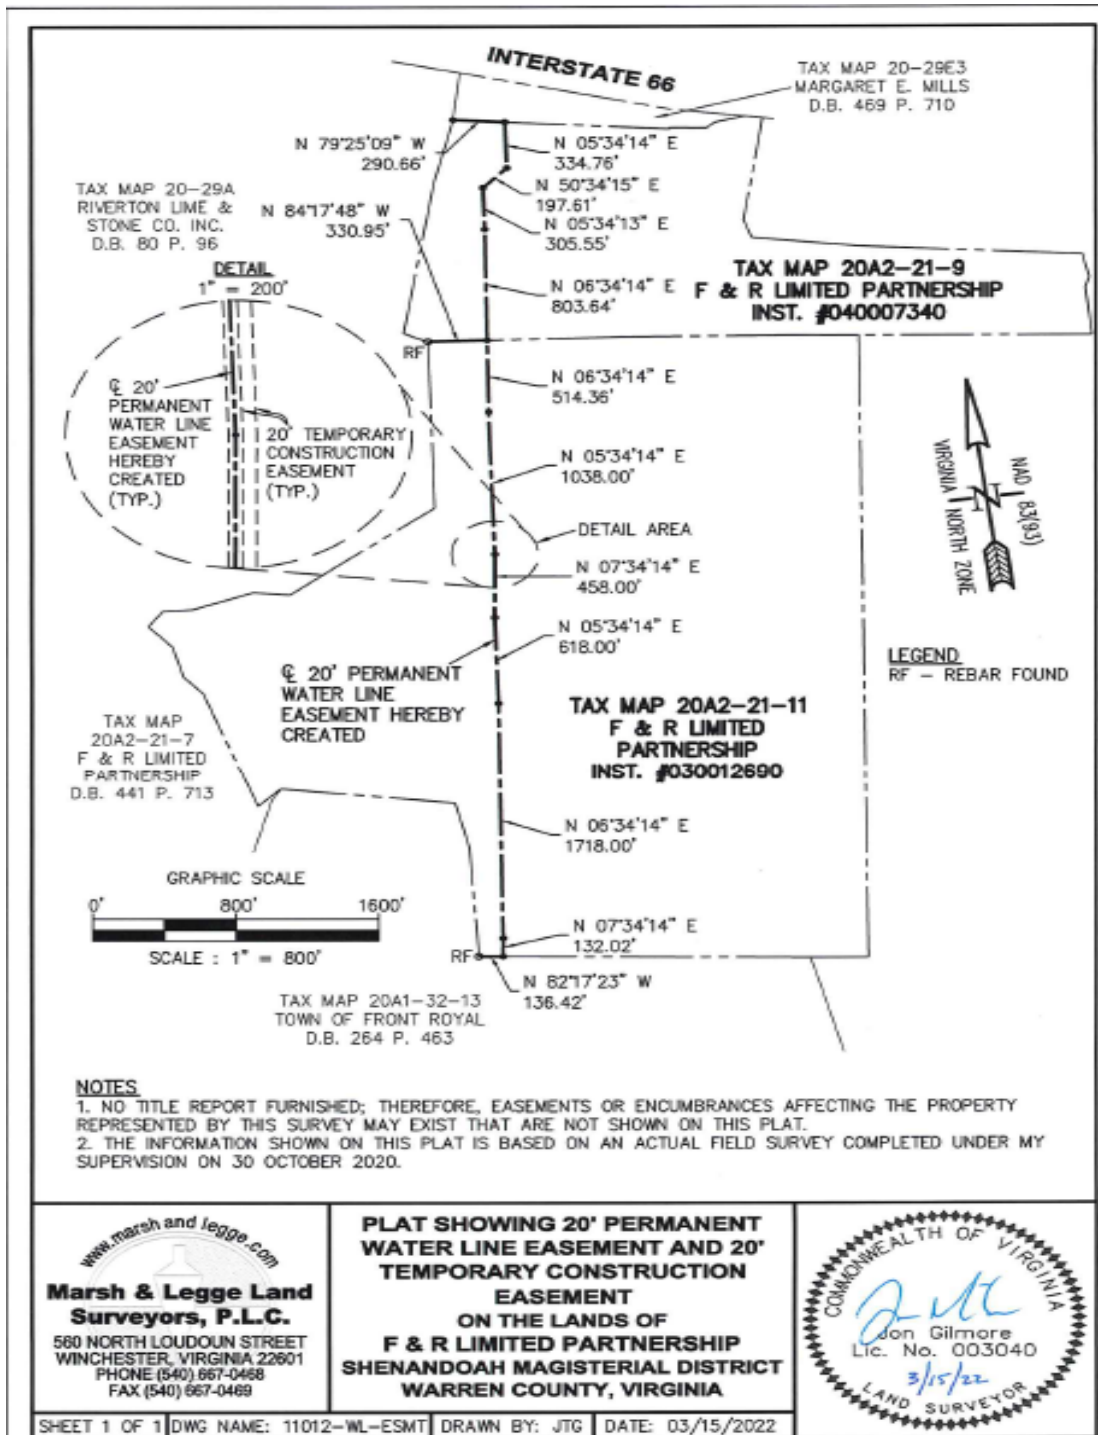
Photo Shows a View of: Proposed Easement Areas
